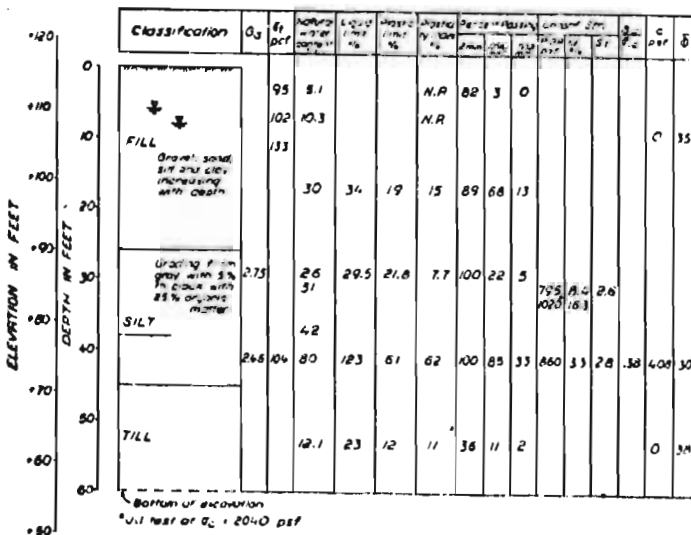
SOIL PROFILE-AT BRACED EXCAVATION
